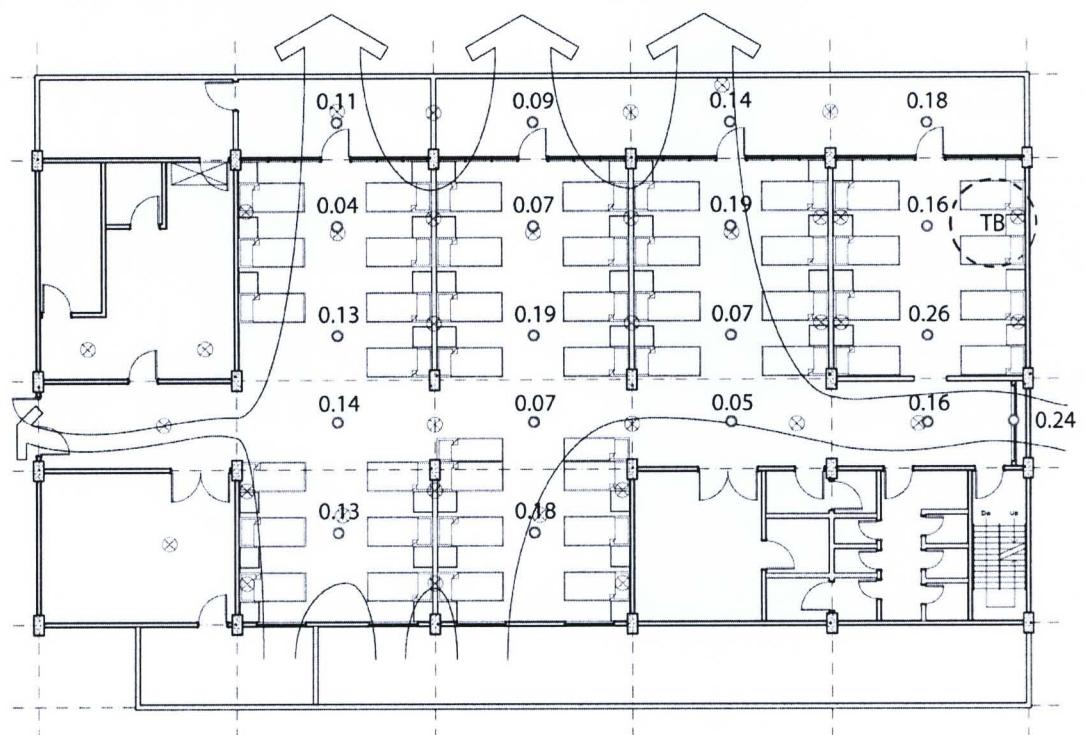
Floor plan and ventilation data of hospital D inpatient ward#1
